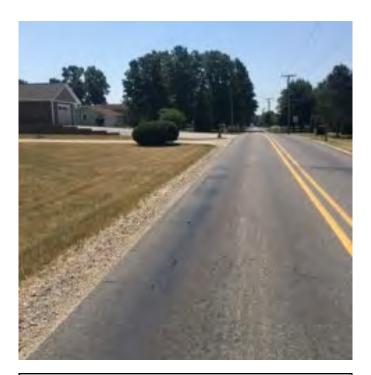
Facing north — view of CR 35 south of U.S. 20.
